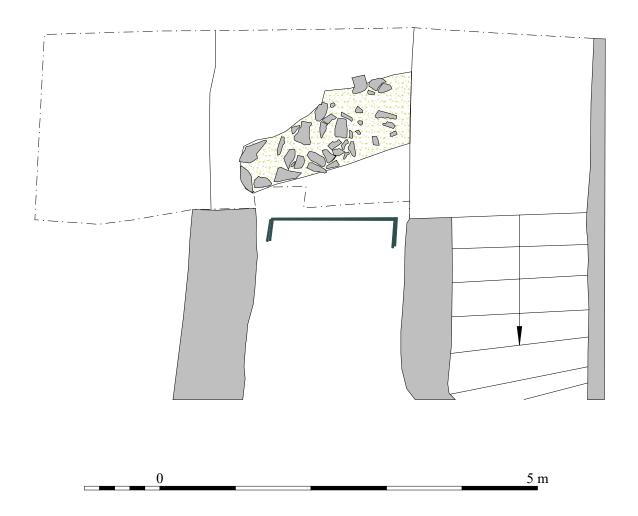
Plan of the Possible Medieval Wall Scale 1:50
